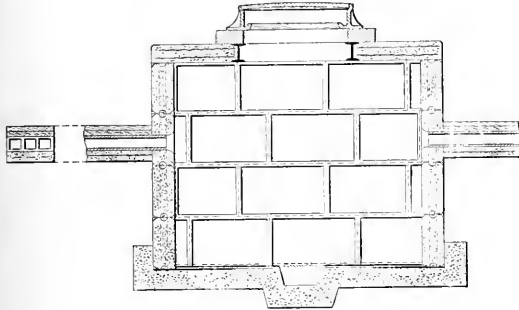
SECTIONAL ELEVATION OF MANHOLE.
